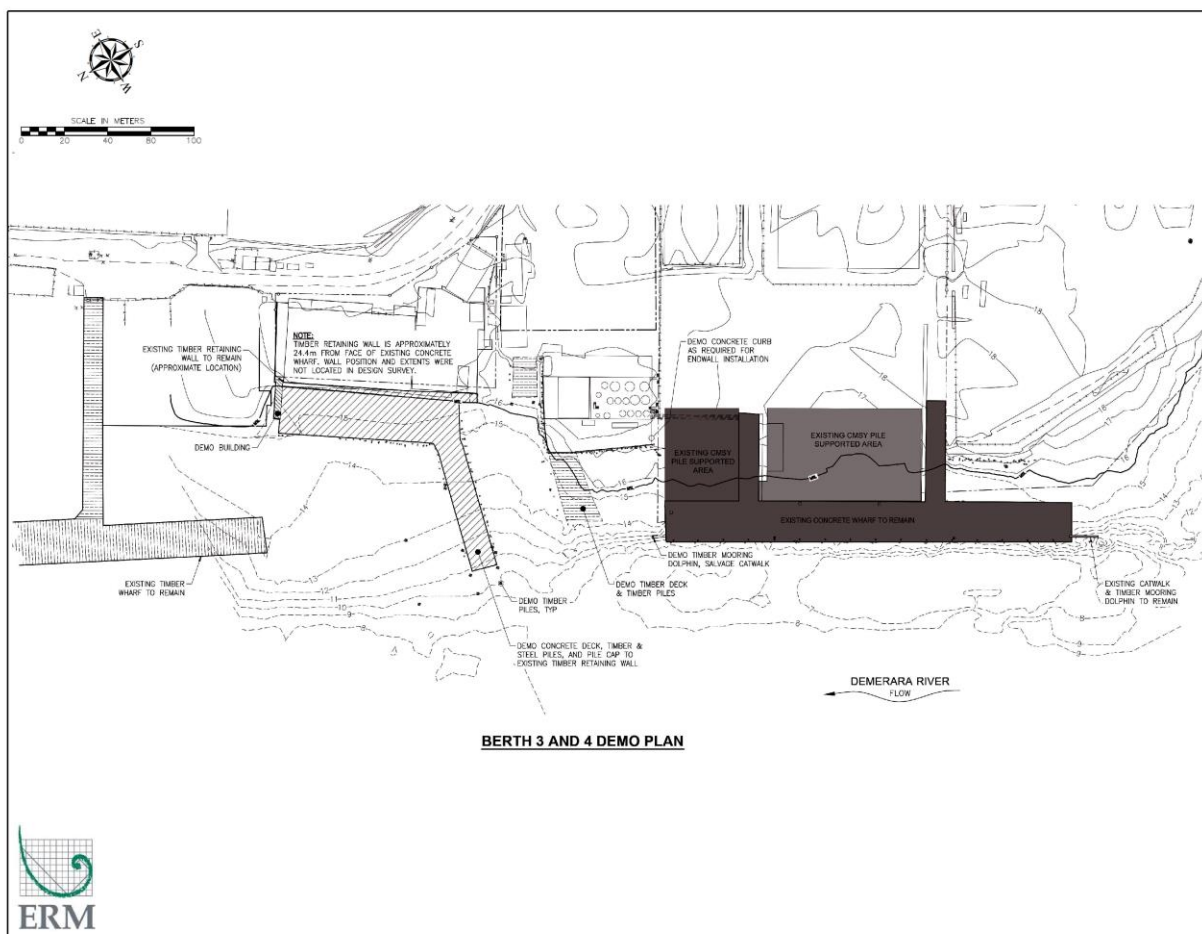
Demolition Plan for the Construction of Berths 3 and 4
